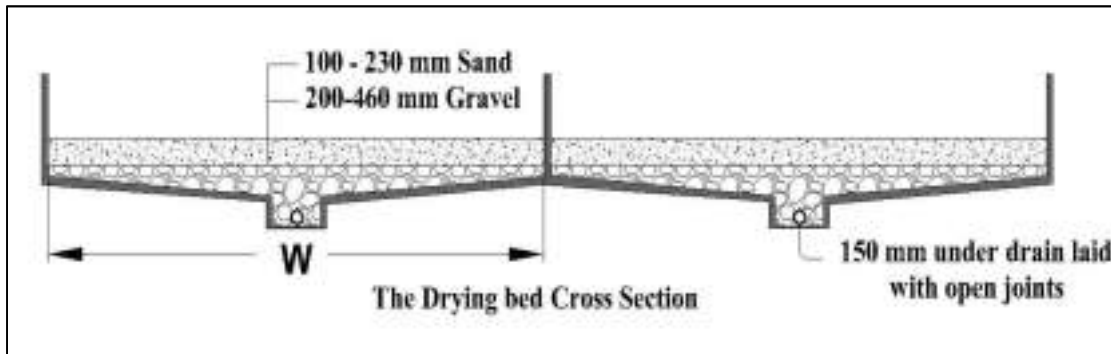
Typical Sand Drying Bed – Cross Section, (Eddy, 2014, p. 872)
